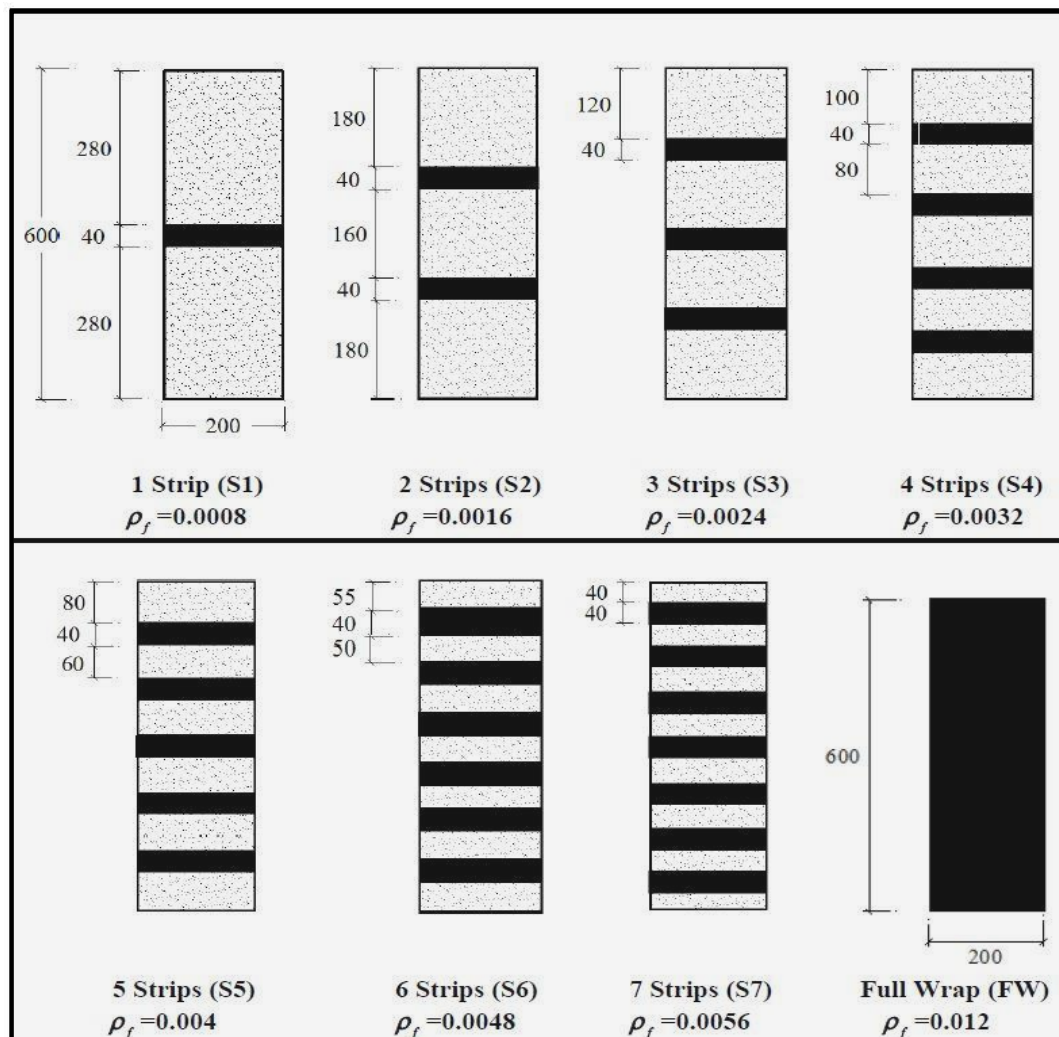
Wrapping of CFRP around the reinforced concrete column
